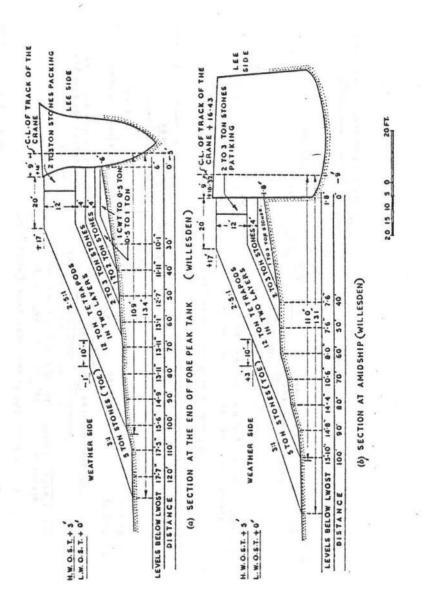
Protection with 12-ton Tetrapods on 2.5 to 1 Slope
